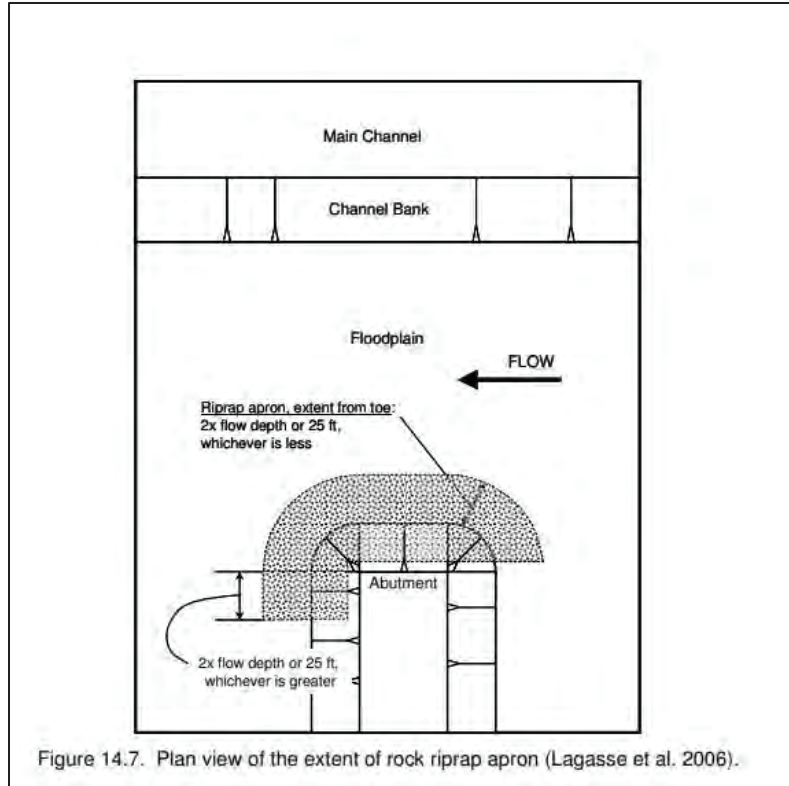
Plan view of the extent of rock riprap apron (Lagasse et al. 2006).
